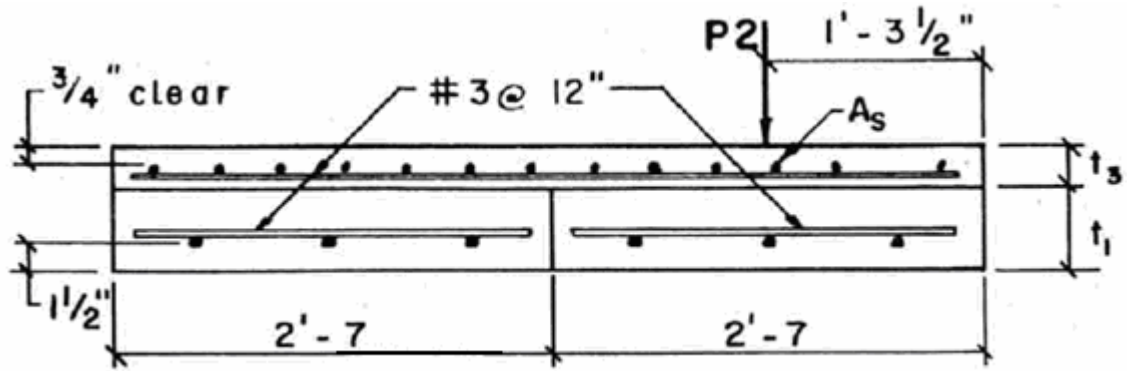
Cross-sectional view of the standard span of the lab specimen used in the study performed by Hays, Jr. et al. (1980)
